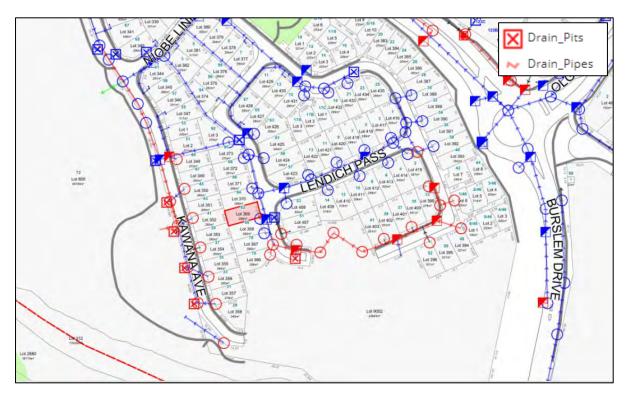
Roadside pipe and pit drainage infrastructure (CoG 2022)
